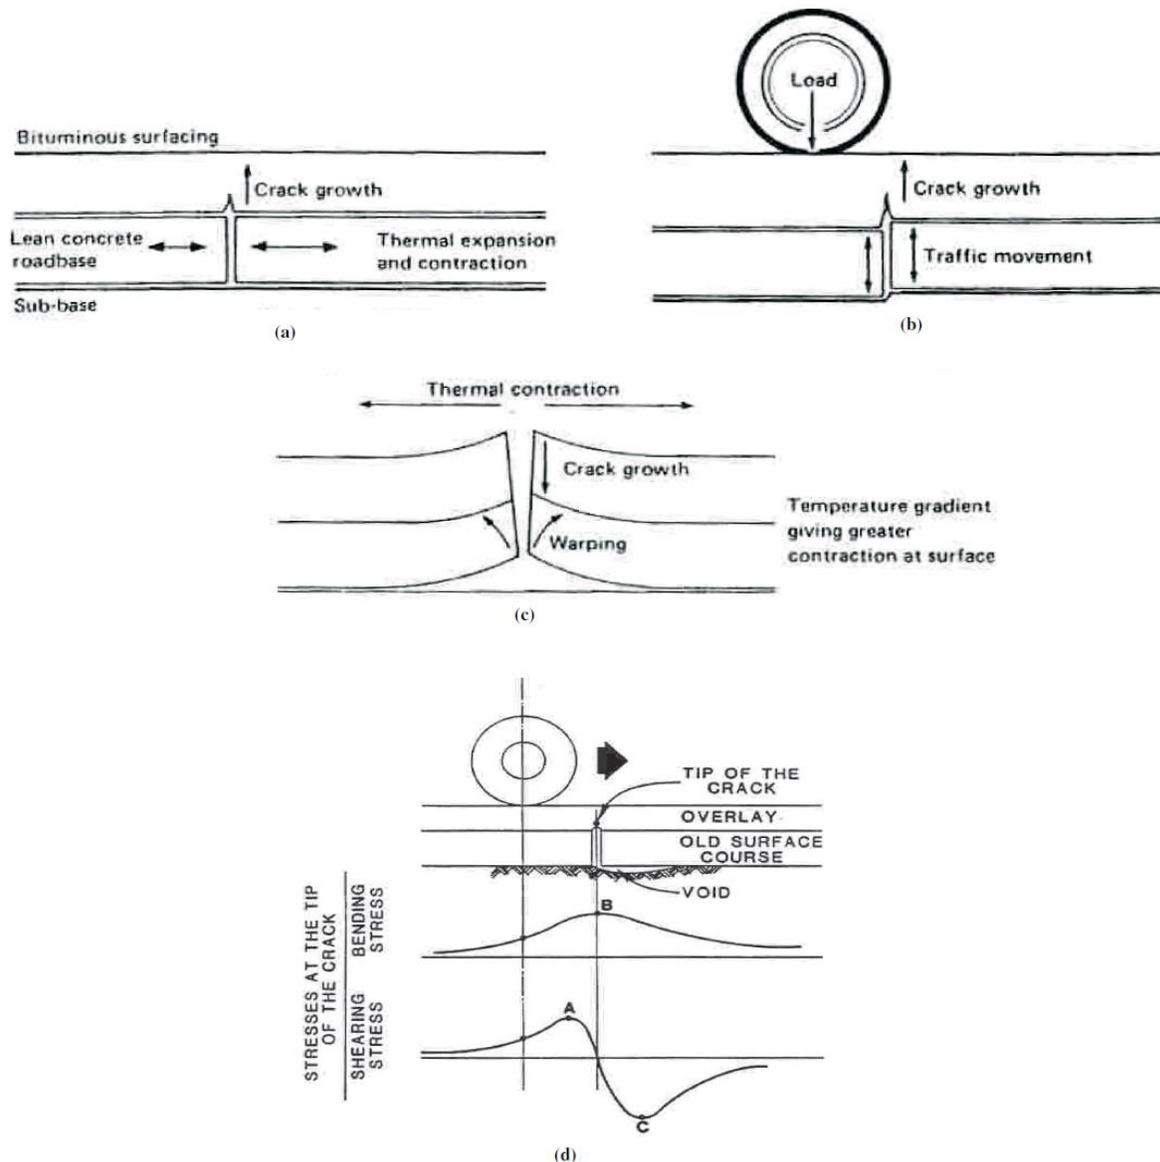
Causes of reflective cracking in AC overlay over a PCC pavement [5].
